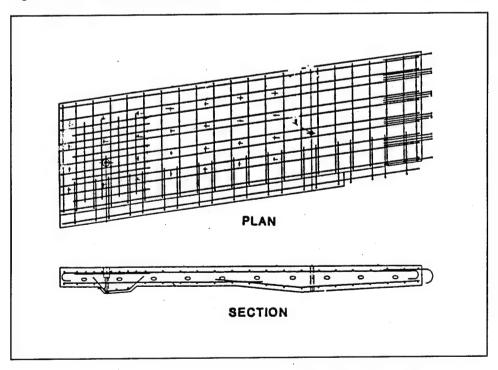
Details of panel reinforcing for Dublin Scioto Bridge (from PCI 1988)
